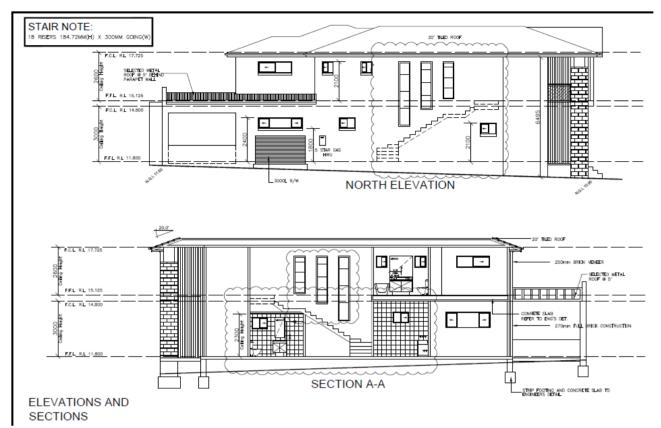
Proposed Development at 12 Septimus Avenue, Punchbowl (Inkon Plans)
